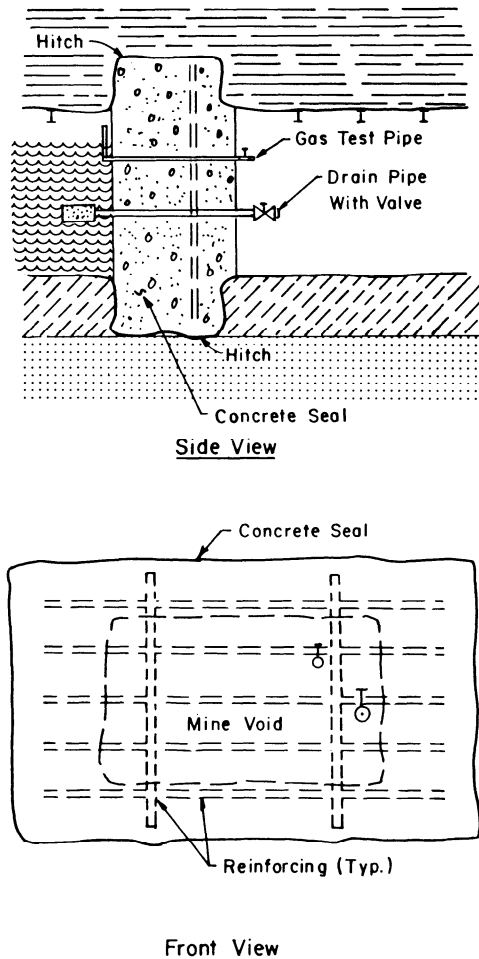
Hydraulic seal of an adit or drift using a single concrete bulkhead (Garcia and Cassidy, 1938).
